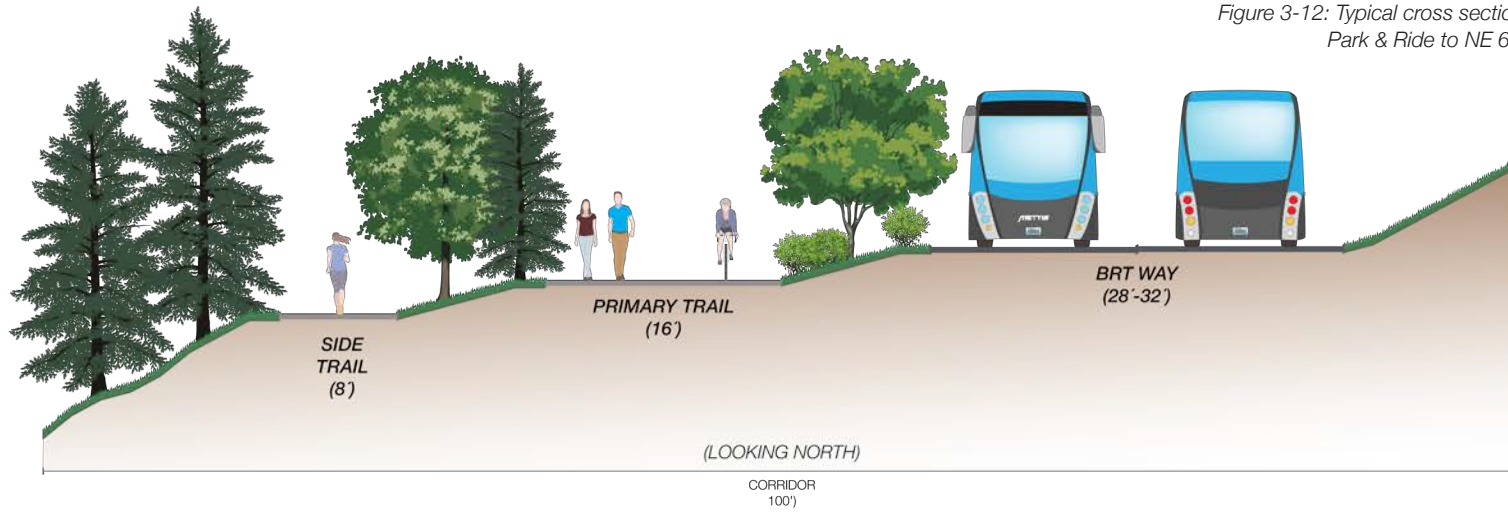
Typical cross section in South Kirkland Park & Ride to NE 68th Street segment
